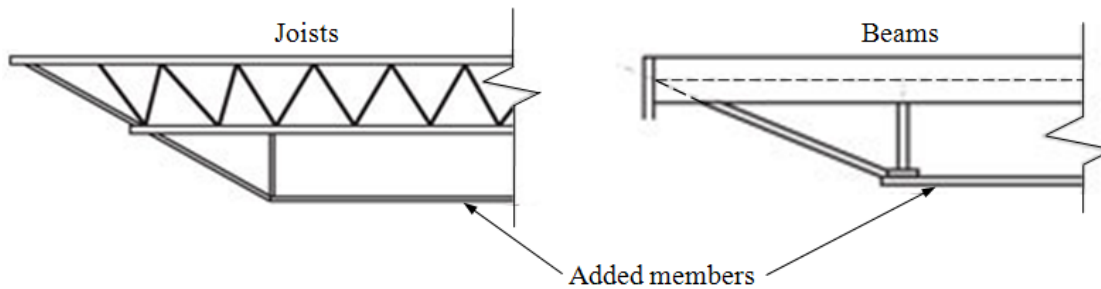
A stiffening technique for steel joists and beams (Allen & Pernica 1998).
